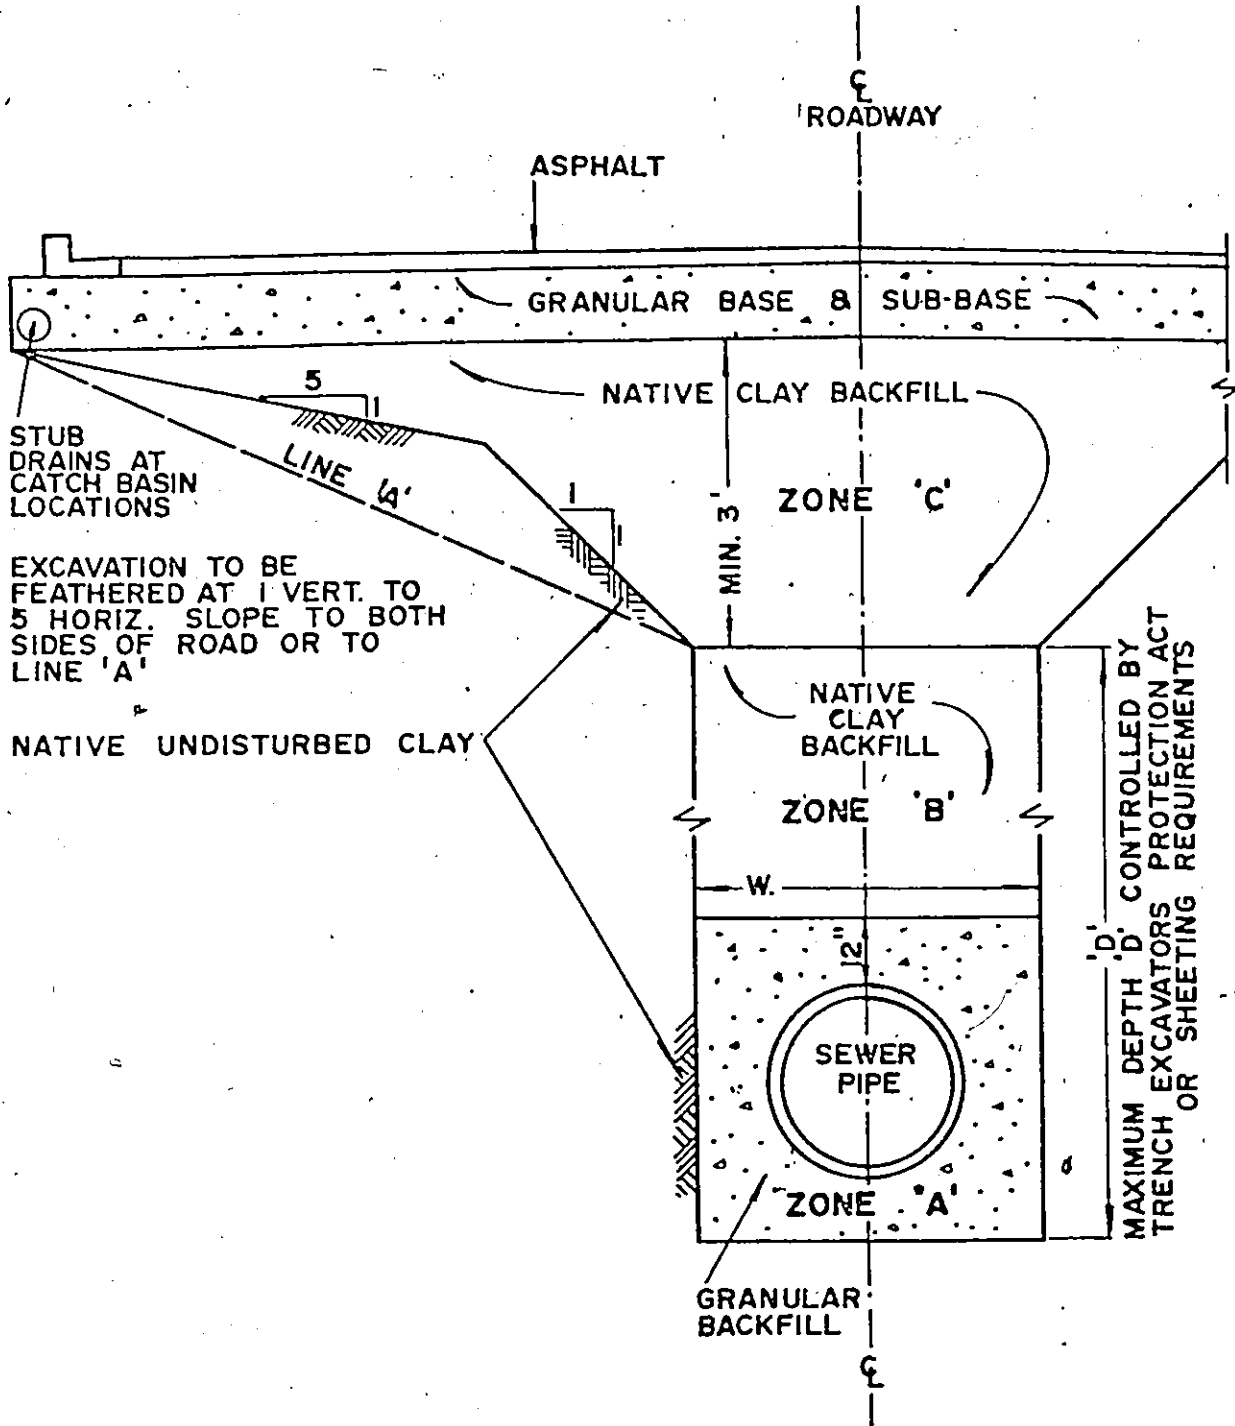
Service Trench Backfill Detail (Single Service) (3)
